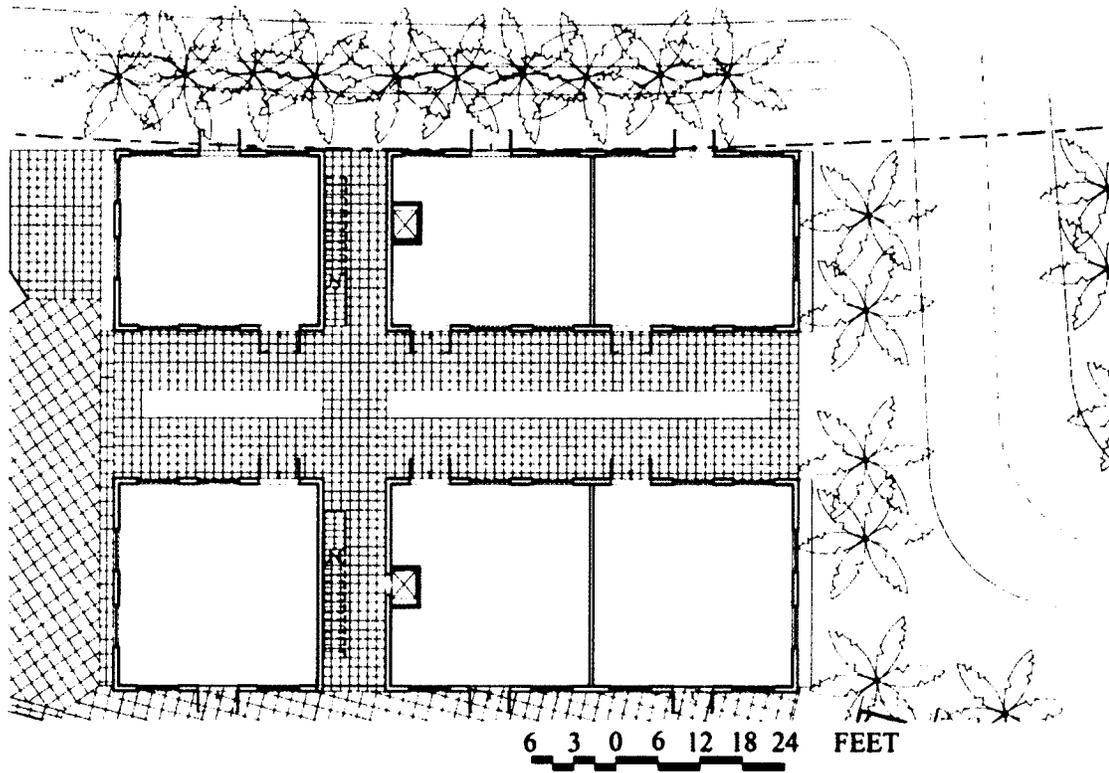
Main Level Plan – Retail Stores (Image by Author)
